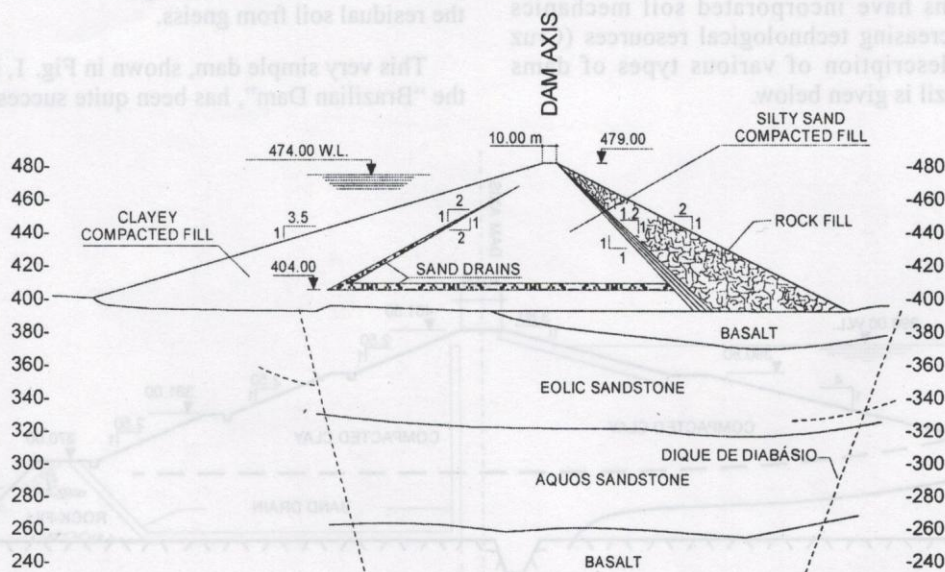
Typical cross-section of the Xavantes Dam (Cadastro Geotécnic 1983)
